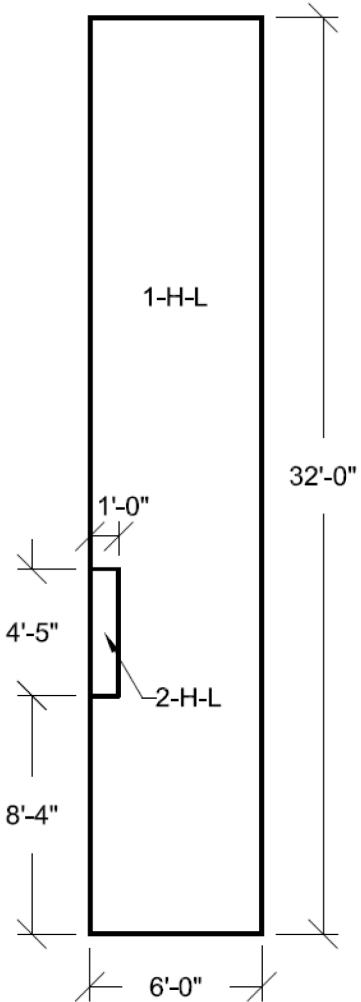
H.6-150 DGFOSV Roof 2 Looking Down
